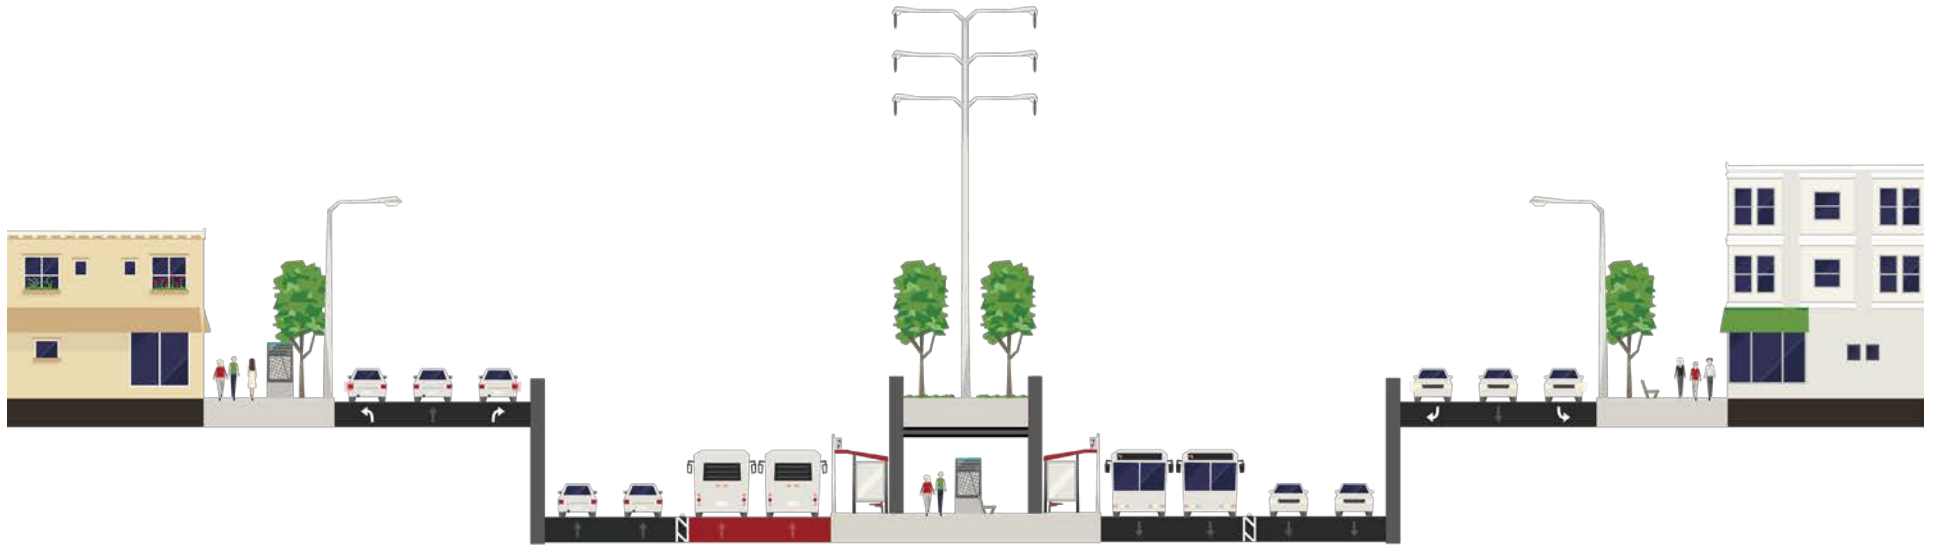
At-station cross section along Korangi Industrial Road (8000 Road)
